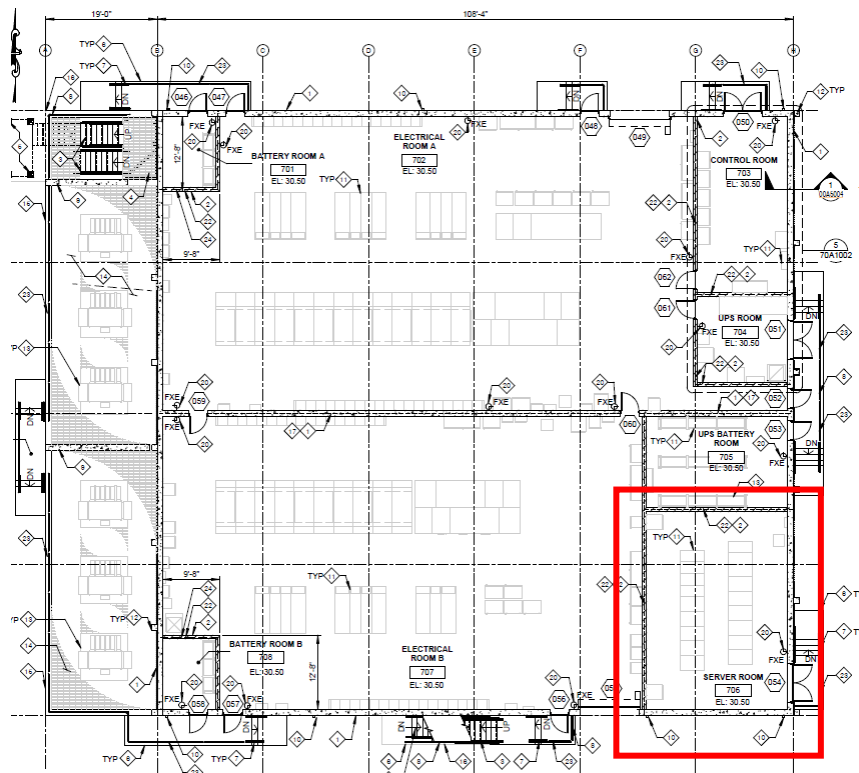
Ground floor plan of future Power Building 3. The server room is inside the red square
